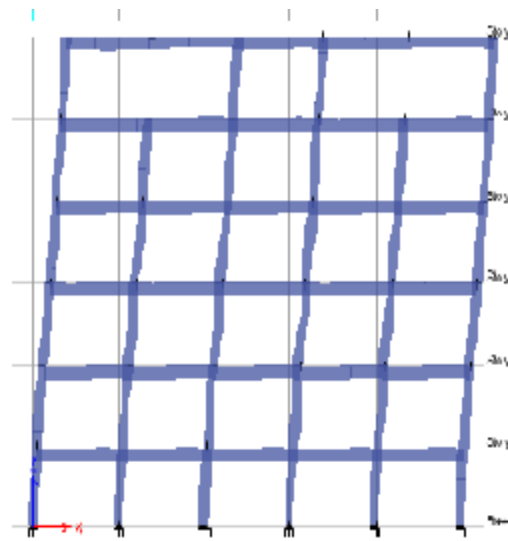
Deformed shape of FC building with lift shear wall provision
